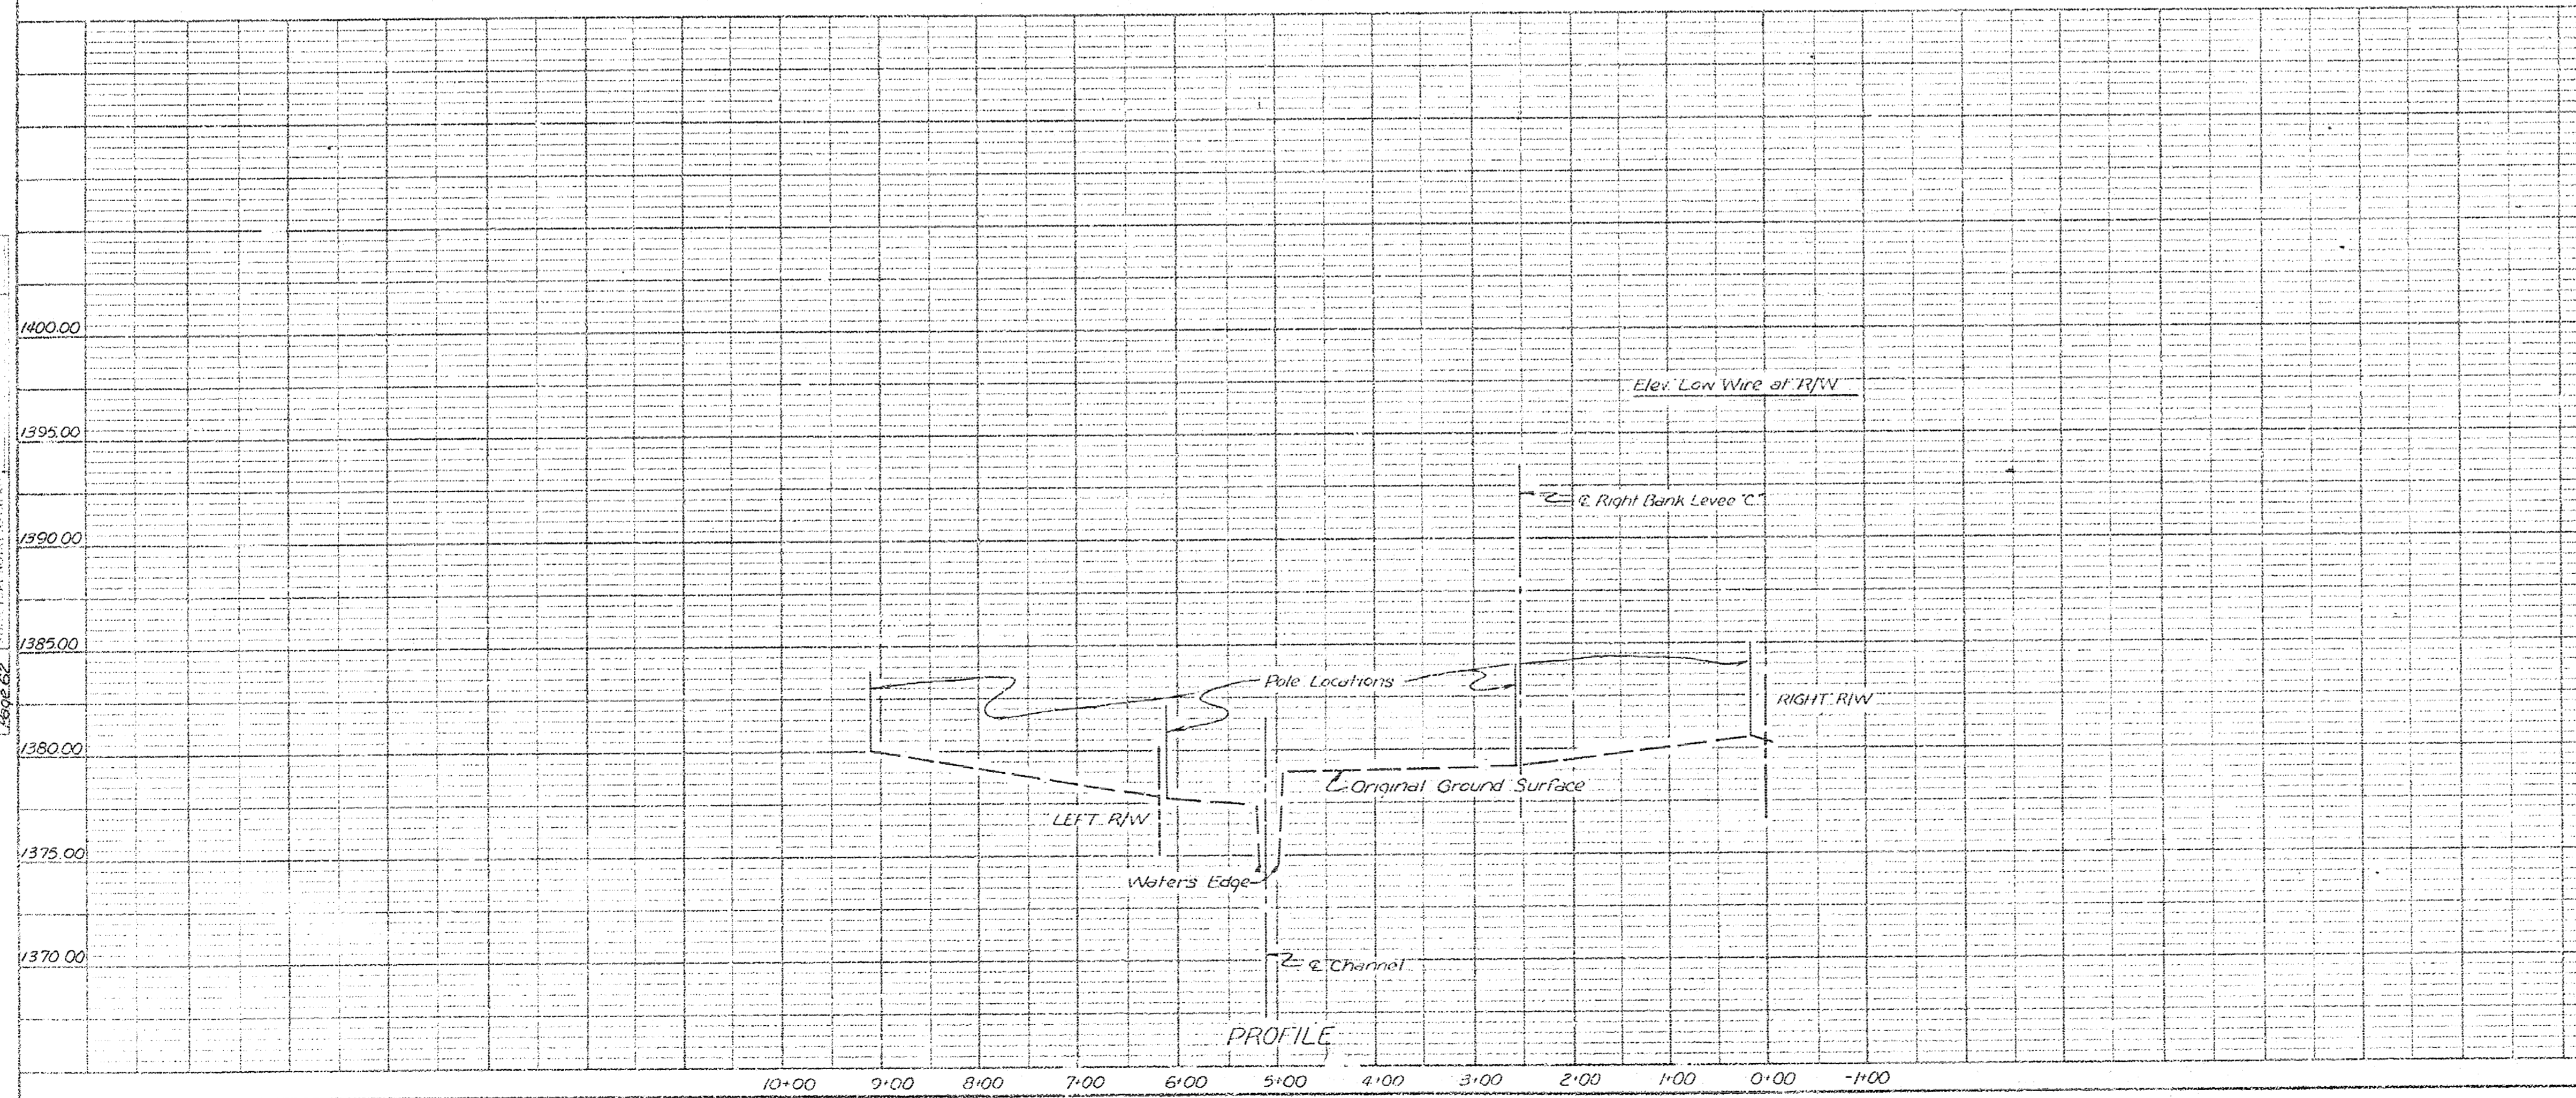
PLAN, PROFILE, & P. & E. 1.
